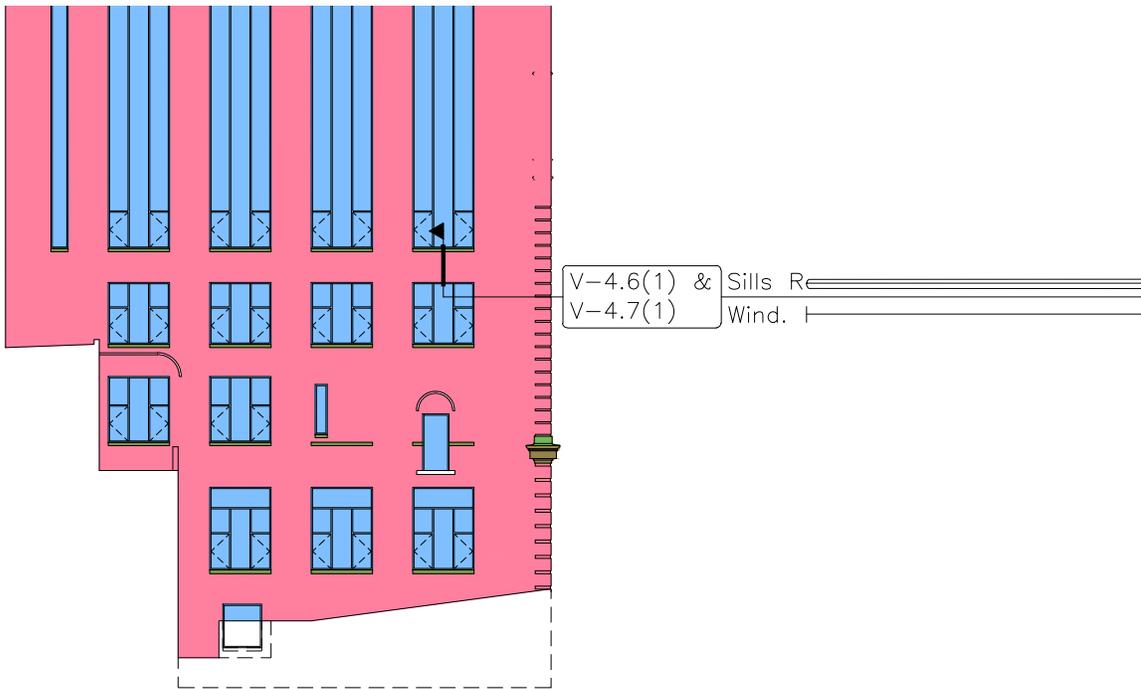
(6): North Courtyard: East-Facing Wall
